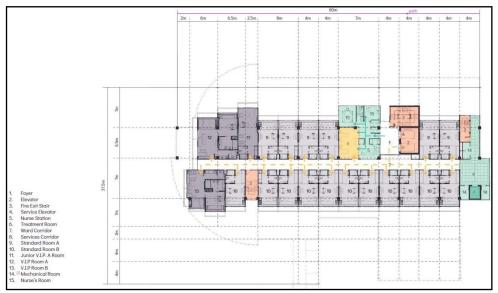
7 Fourth and Fifth Floor Plan, EKH Children's Hospital
